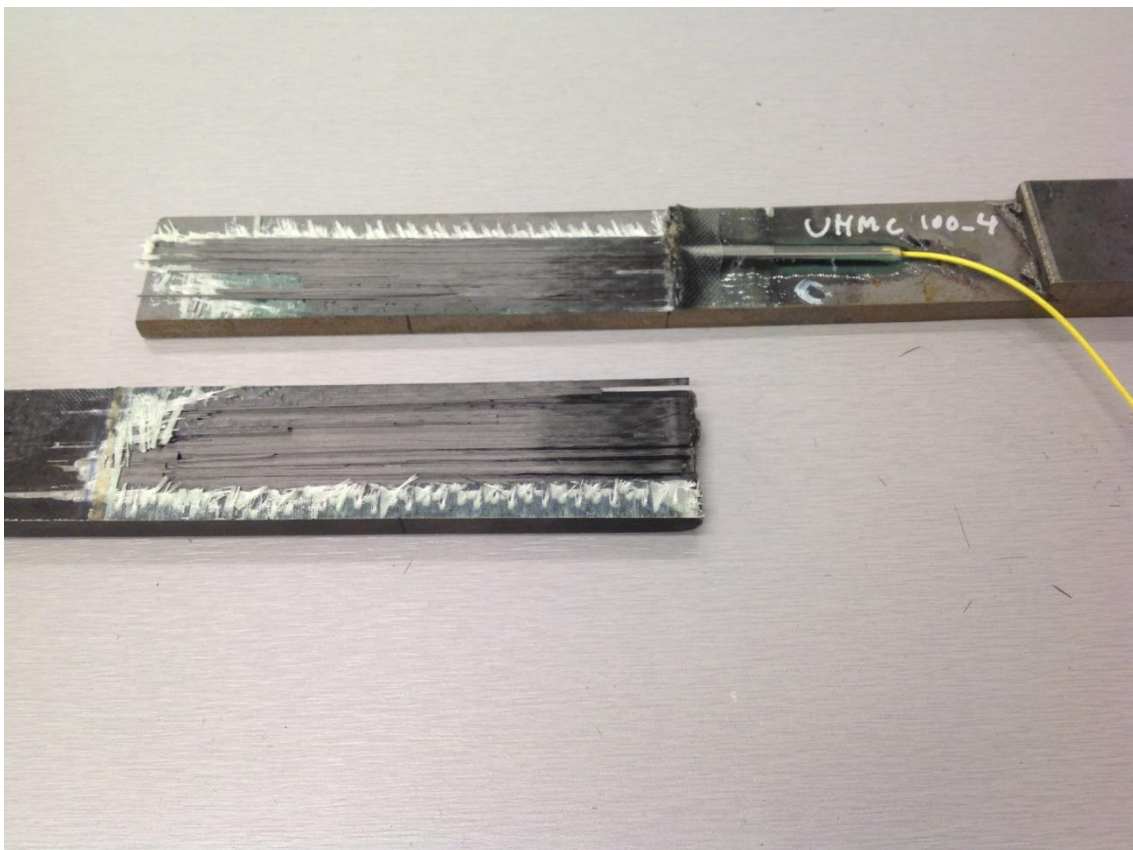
Failure in UHMC100_4 showing delamination, clear debonding of adhesive layer and fibre fracture.
